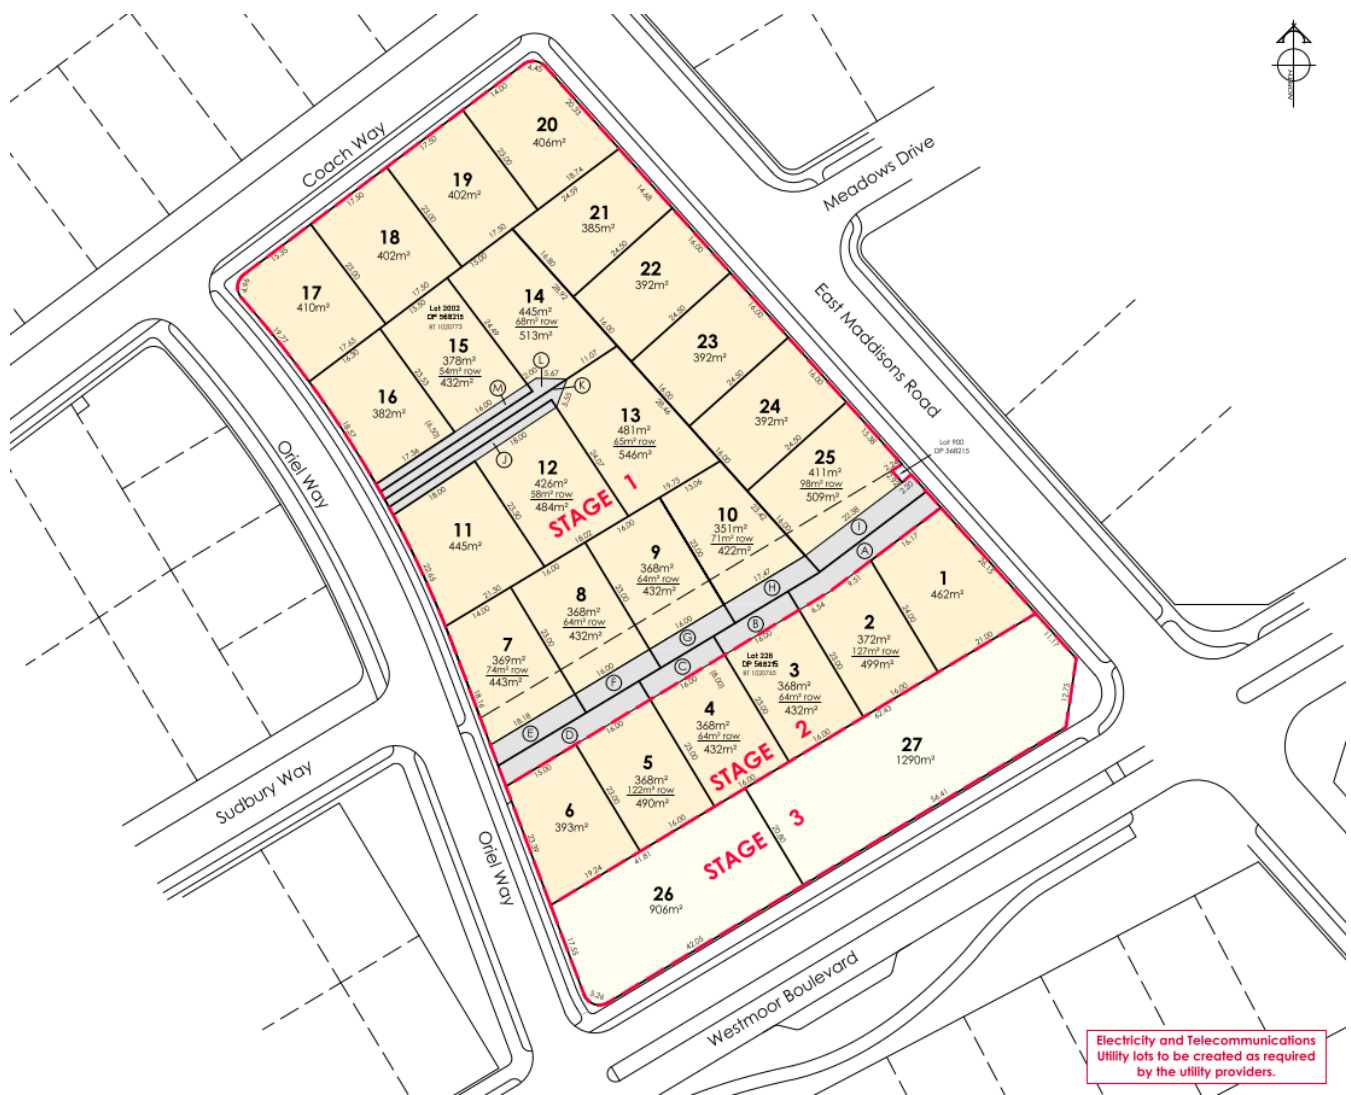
Proposed subdivision scheme plan and immediate environment (Source: Application)
